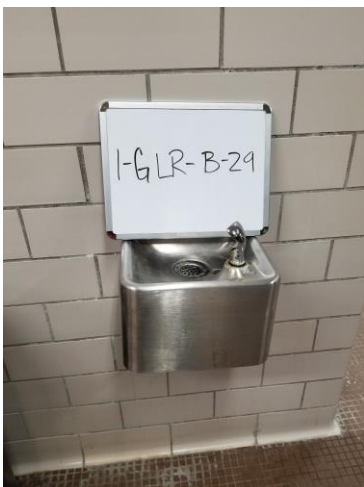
Bubbler, located on the 1st floor in the girls locker room.
